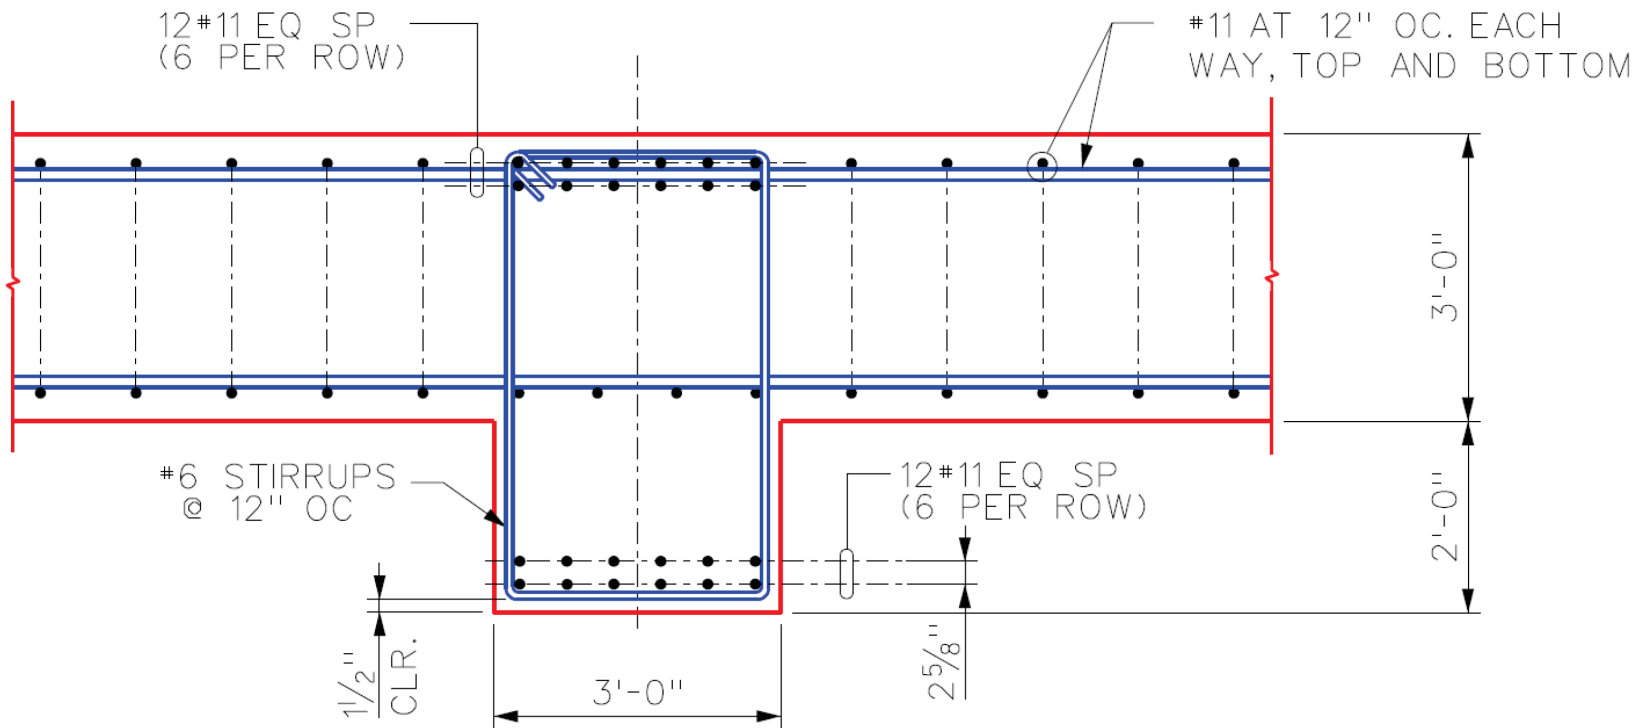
B-86: Reactor Building Basemat Perimeter Elements
